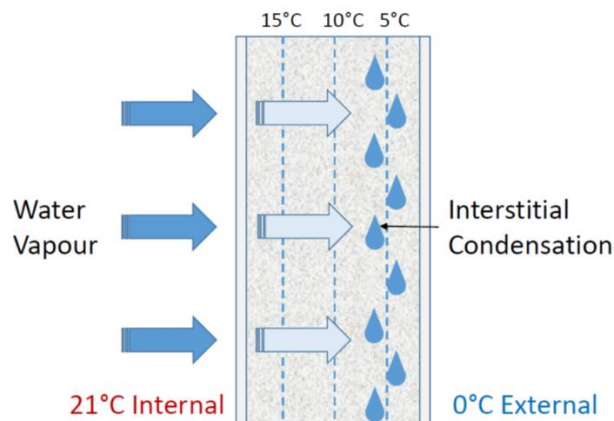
Interstitial Condensation leading to internal damage of wall
